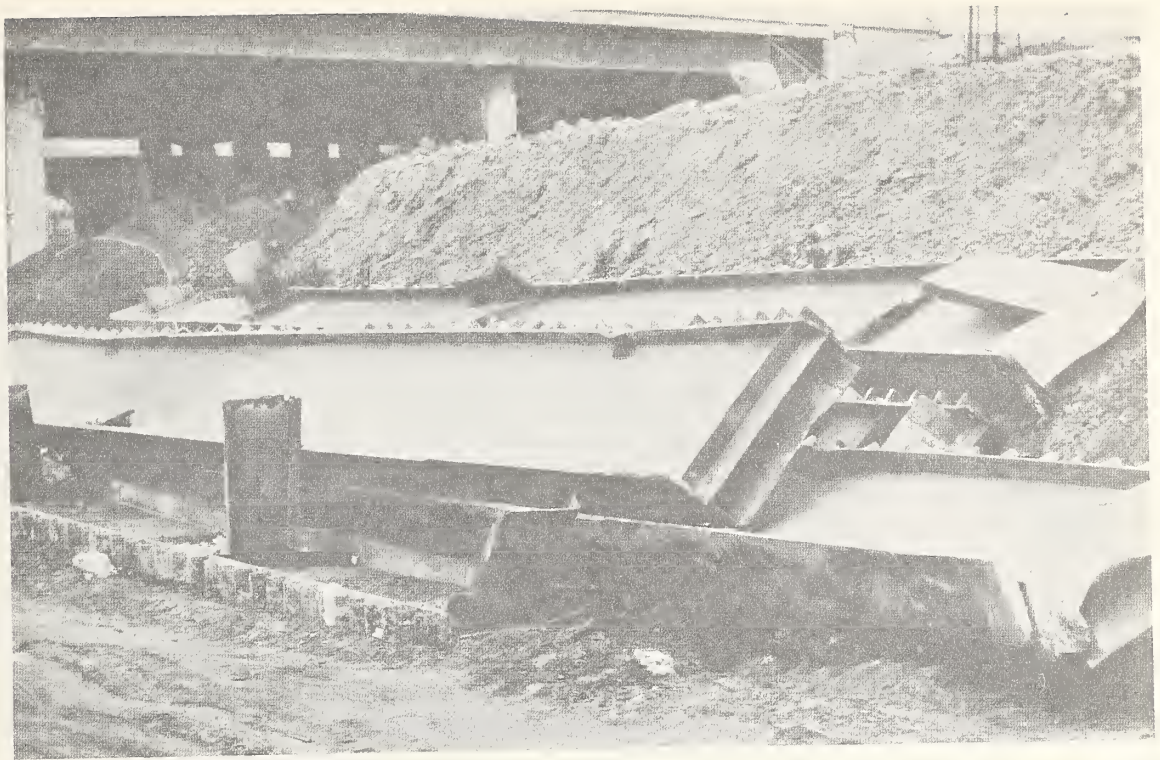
Steel girders taken from San Fernando Road Overhead
